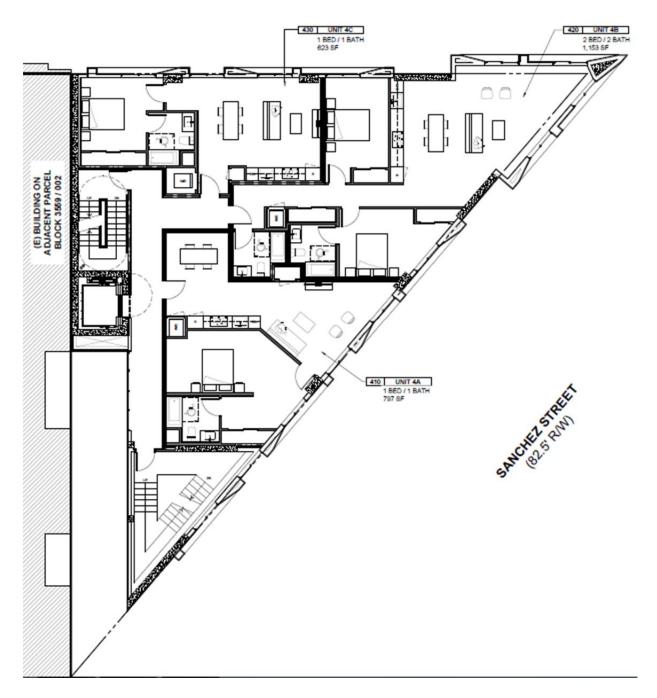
PROPOSED FOURTH FLOOR PLAN
